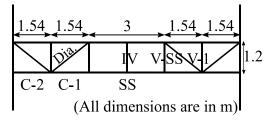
Truss configuration of STMF with multiple vierendeel panels in SS.
